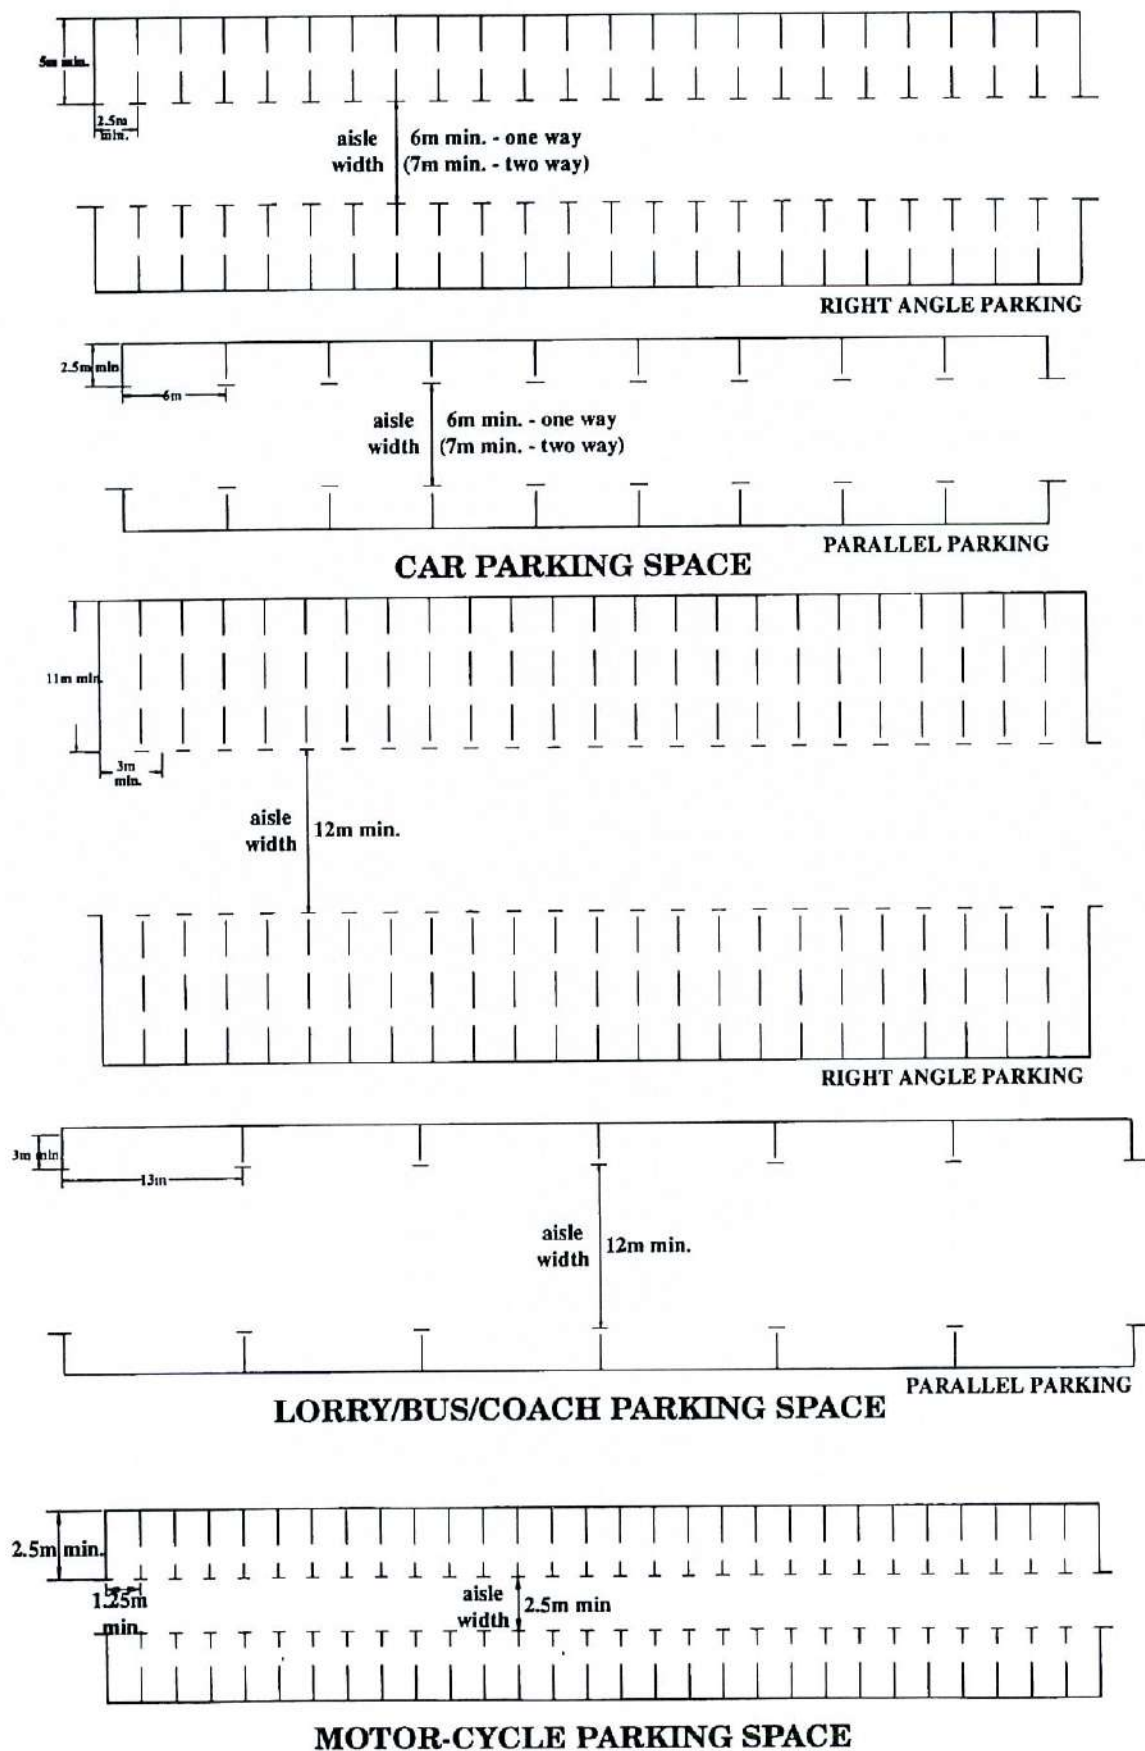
MINIMUM DIMENSIONS OF PARKING SPACES
